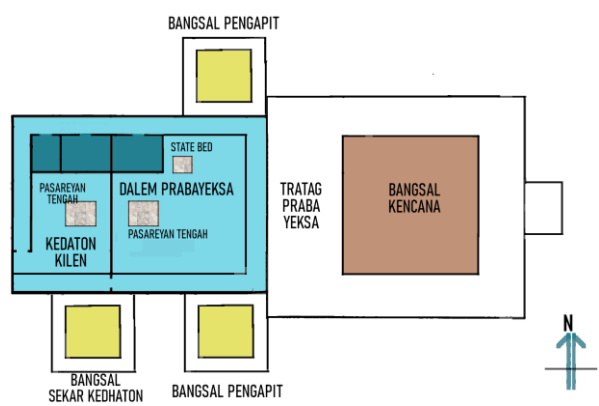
Schematic plan of the original Dalem Prabayeksa [Source: Yulianto]
